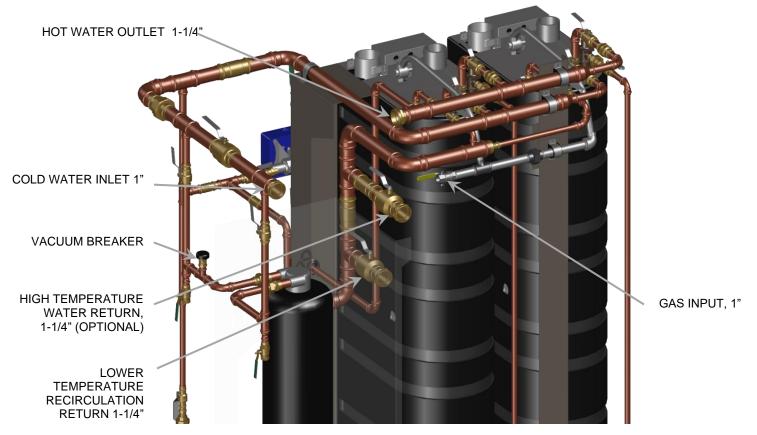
Gas and Water Connections – Stanchion Transparent
